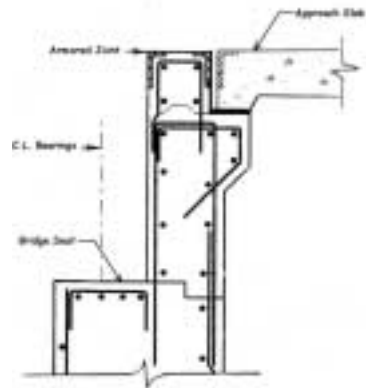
Convention Abutment Detail. Note the gap between the edge of the approach slab and the edge of the header.
